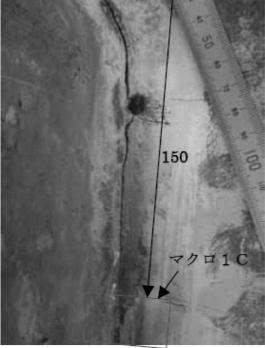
Macroscopic Specimen from 90-Degree Rounded Detail with Fatigue Cracks
